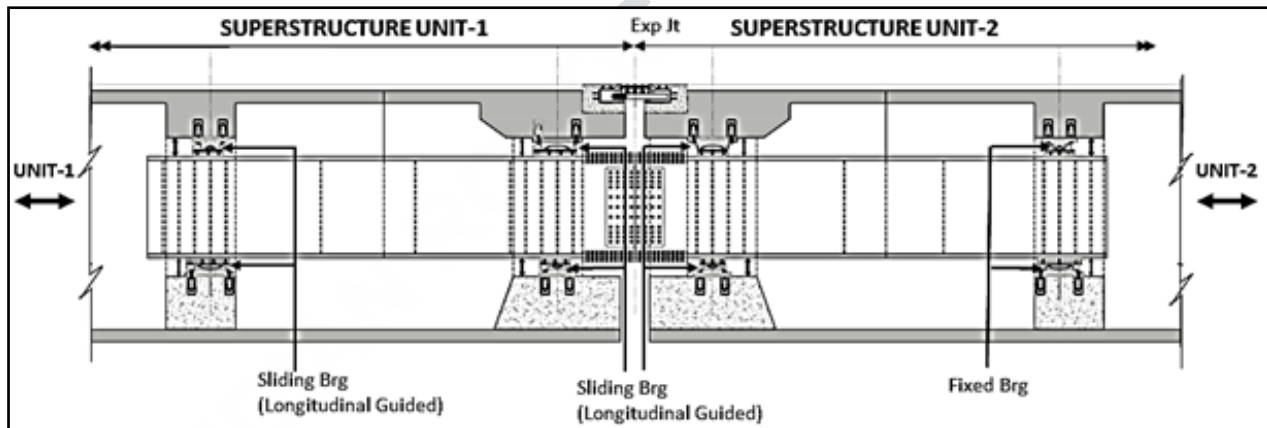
Needle Beam Arrangement at center of span-Barapullah Extradosed Bridge, Delhi
